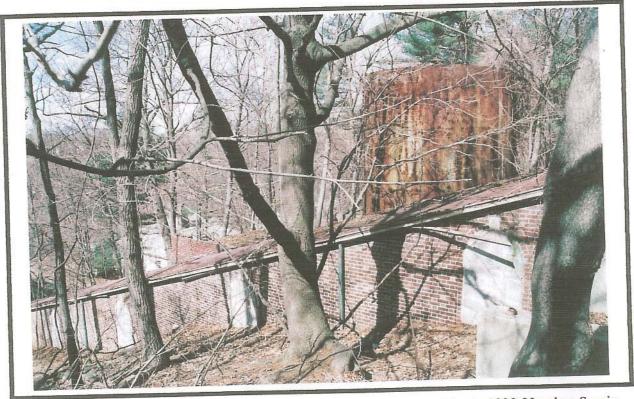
Brick structure enclosing Otis Incline Railway. Structure dates to 1928-29, when Sprain Ridge Hospital merged with the House of Rest. View to northwest.
